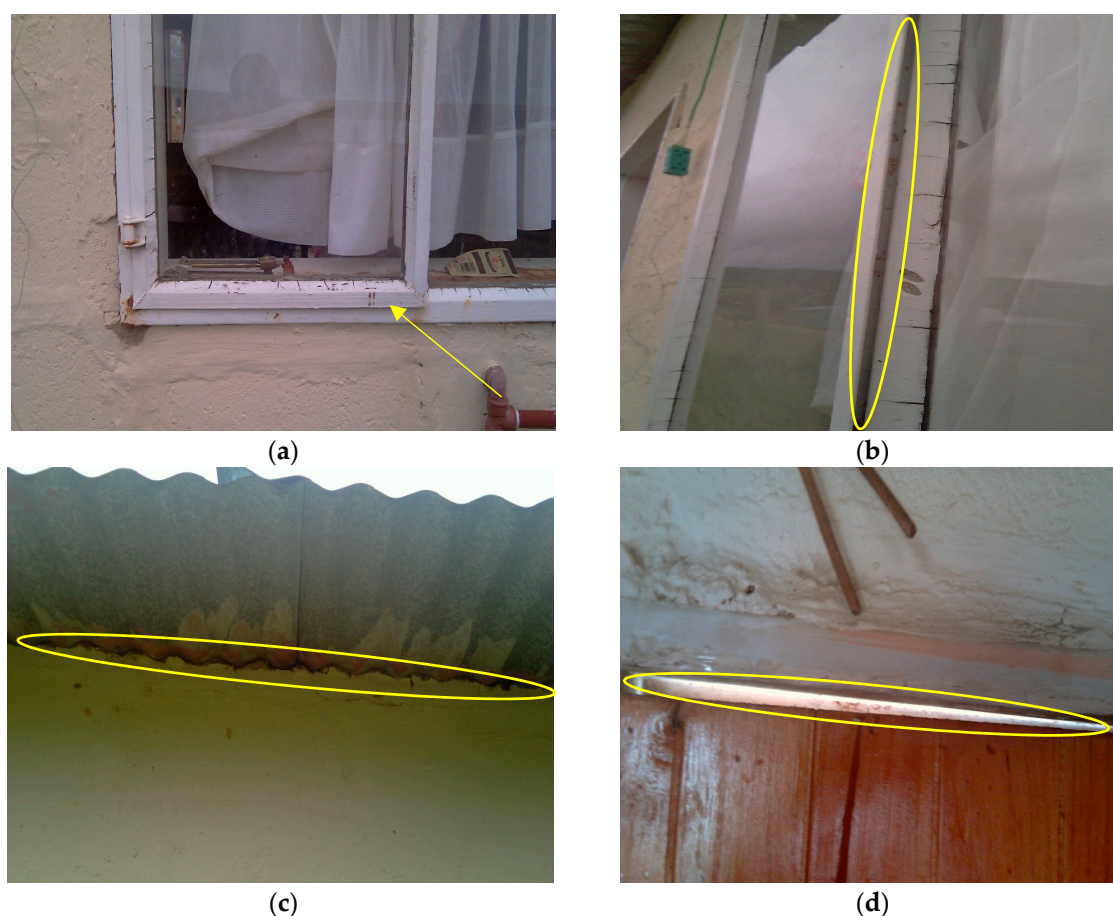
(a) Loose windows even while closed; (b) space between the window and its frame; (c) cracks between the roof and the building wall; and (d) opening between the door and its frame.
